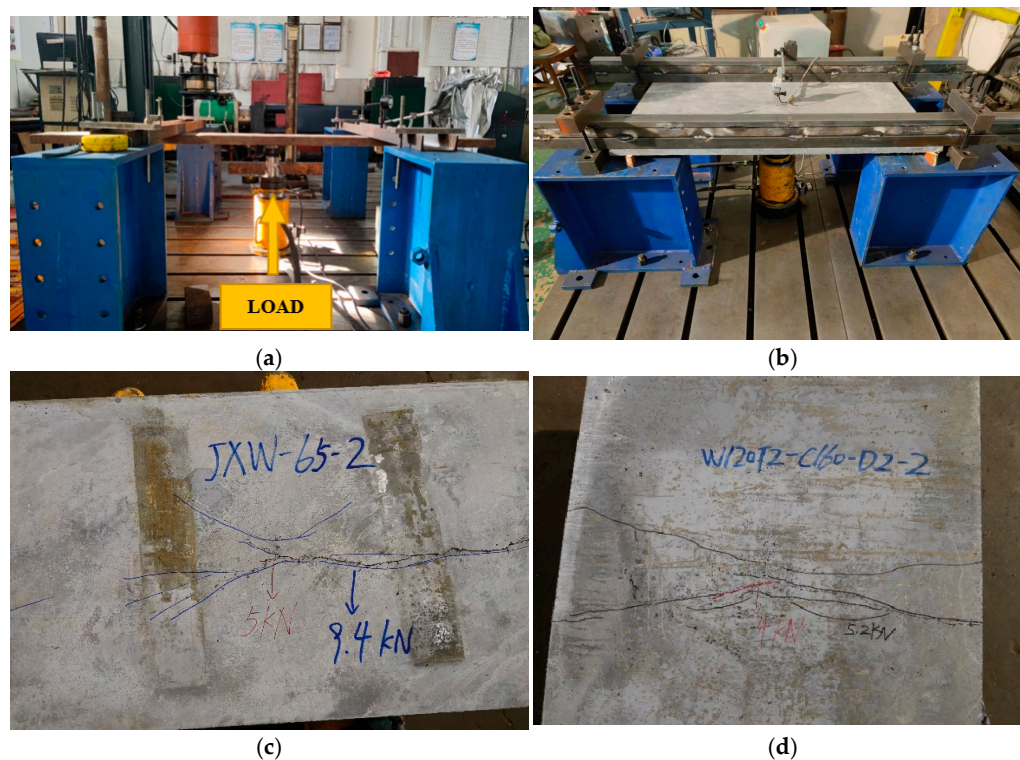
Loading test and test specimens: (a) Concentrated loading diagram; (b) RPC slab test site; (c) 650 mm slab width + C140 RPC slab; (d) 1200 mm slab width + C160 RPC slab.
